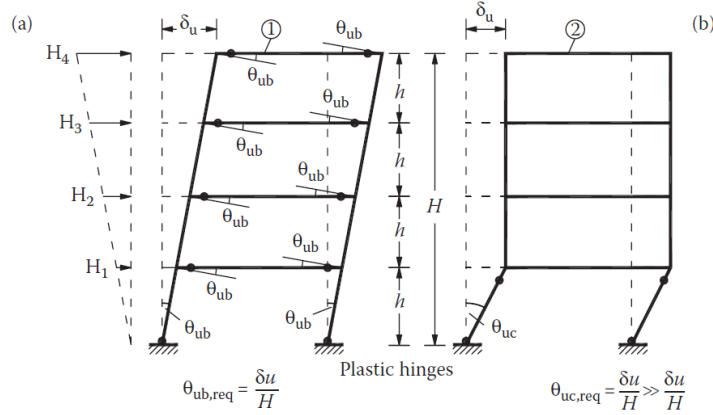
Failure mechanism of a frame: (a) Beam mechanism; (b) soft-storey mechanism;
